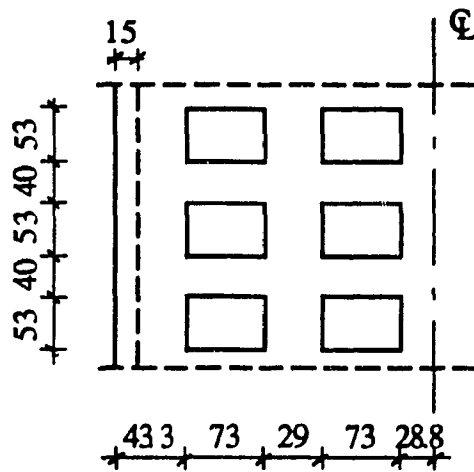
Plan layout of unsymmetric 20-story space frame
